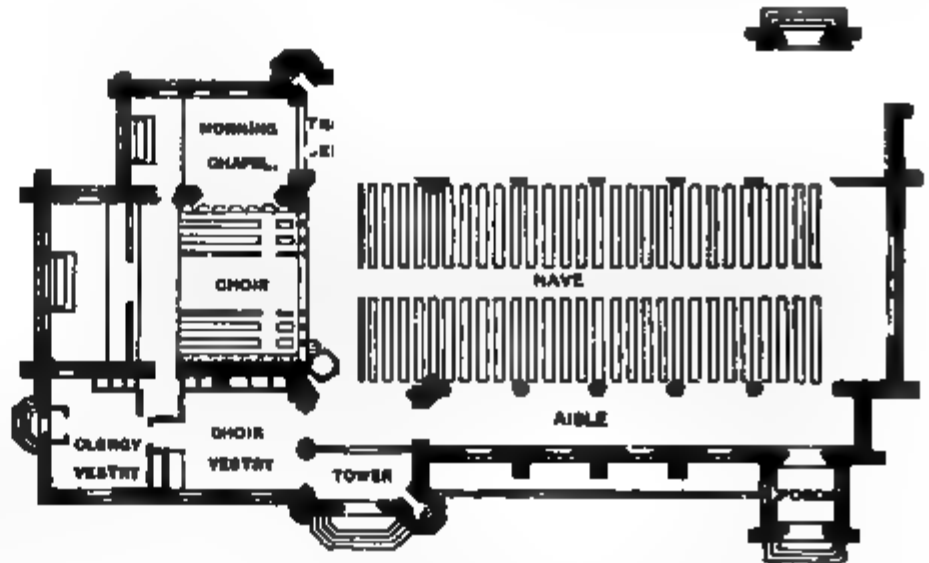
Protestant Episcopal Christ Church, New Haven, Conn.
